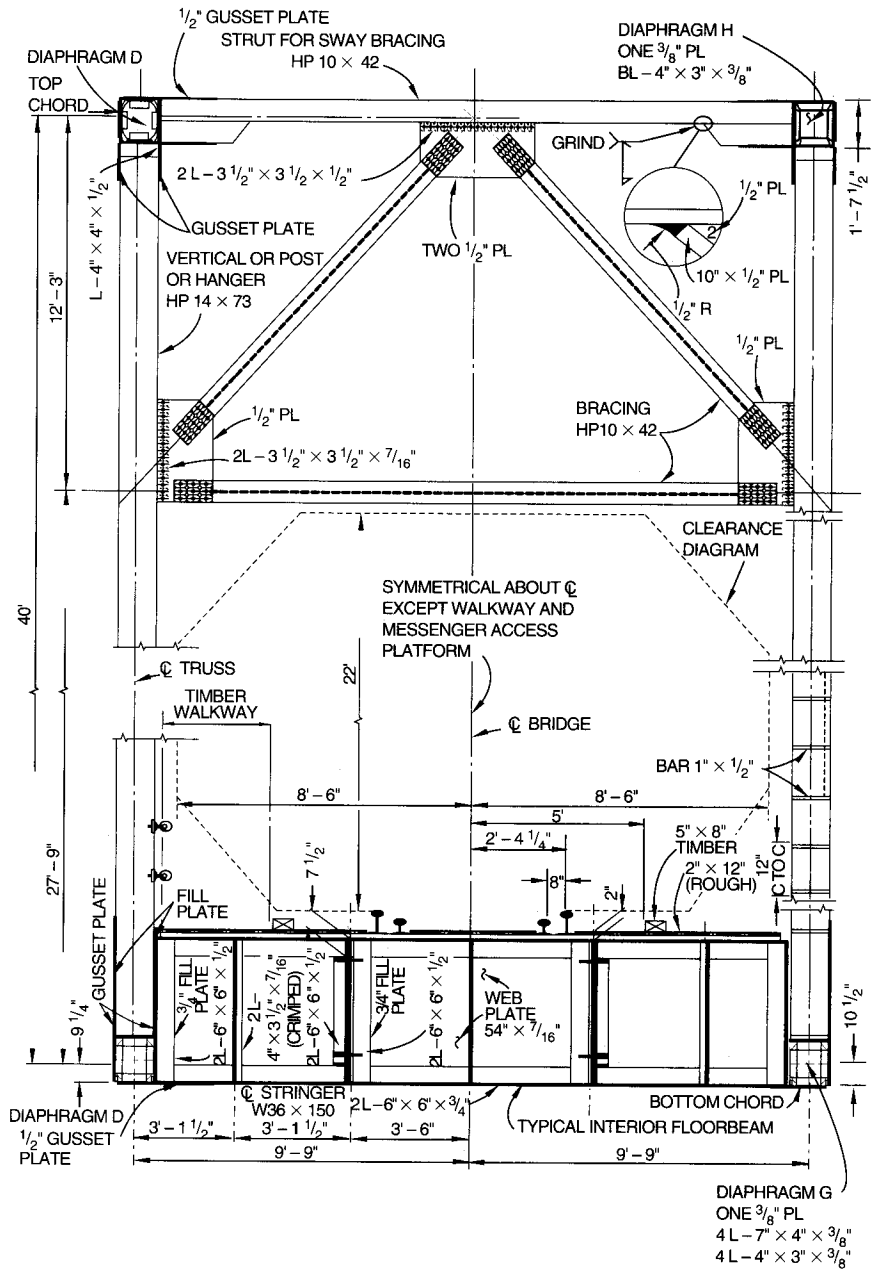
Cross section shows principal parts of a through-truss railway bridge.
